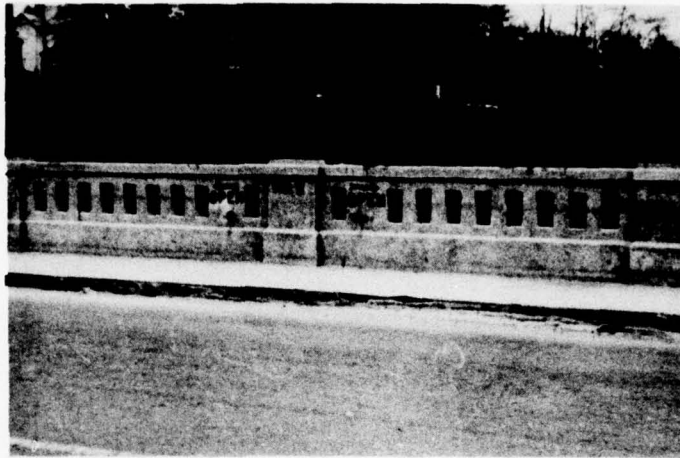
View of the upstream spillway bridge railing, where the low level outlet gate crank extensions pass through
